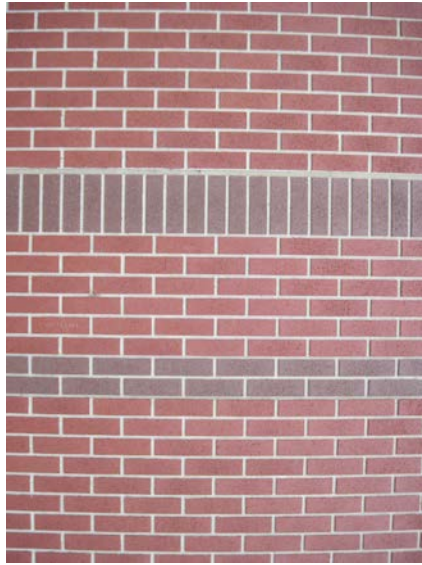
Precast Wall Panel with Brick Veneer and White Concrete Backing.
